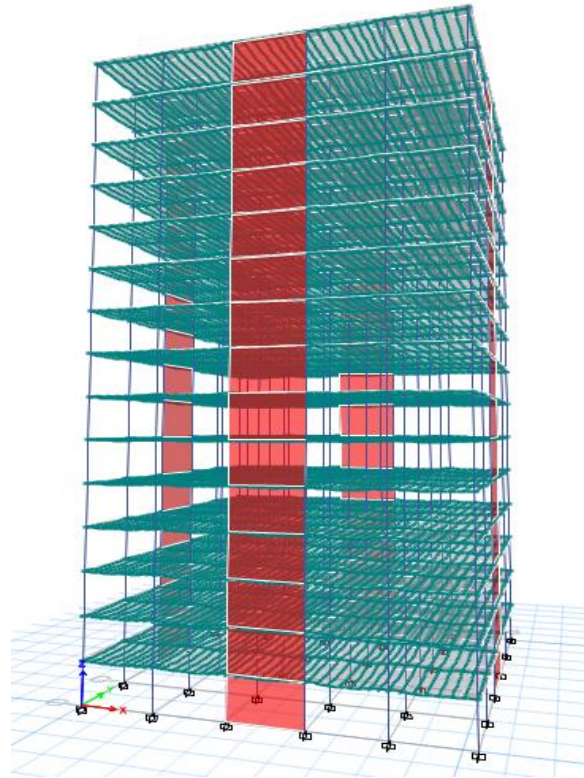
Elevation of Post-tensioned Flat slab structure with Parallel Shear wall along periphery
